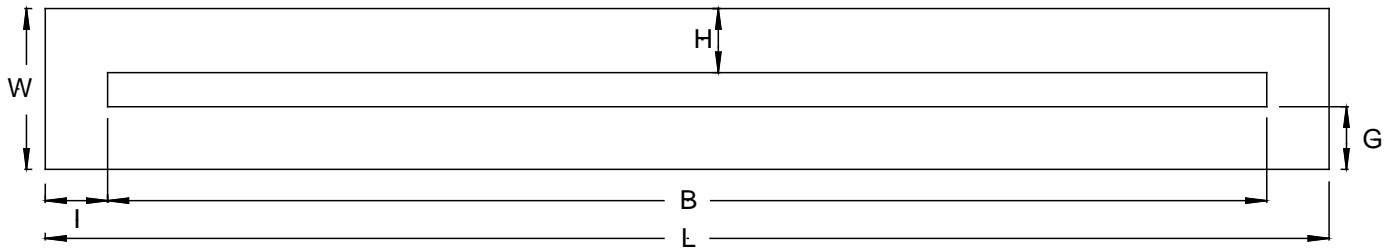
PLAN VIEW – PRESSURE ELEVATED MOUND SYSTEM
